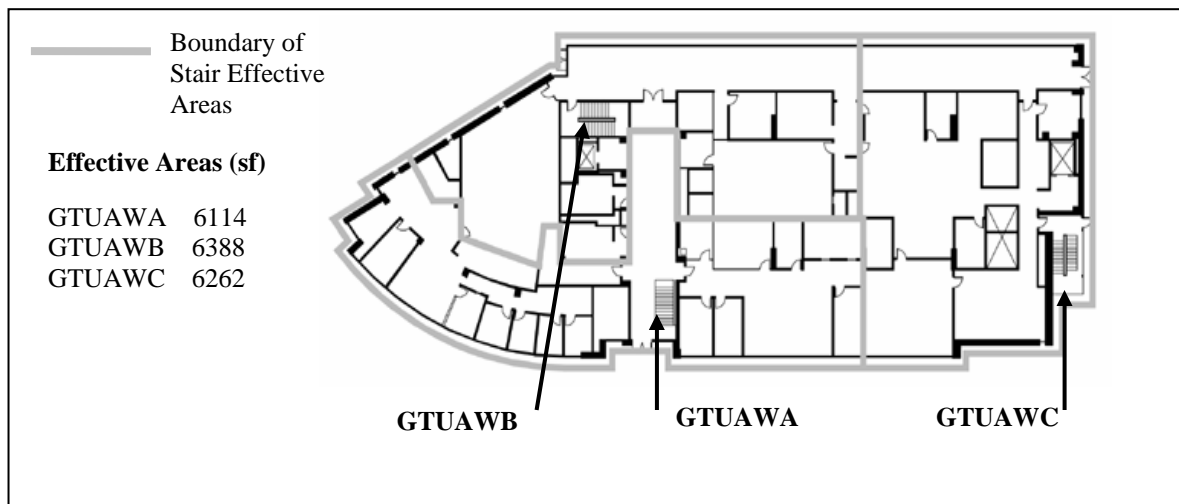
Plan indicating Effective Areas of Stairs on the First Floor of Building GTUAW
